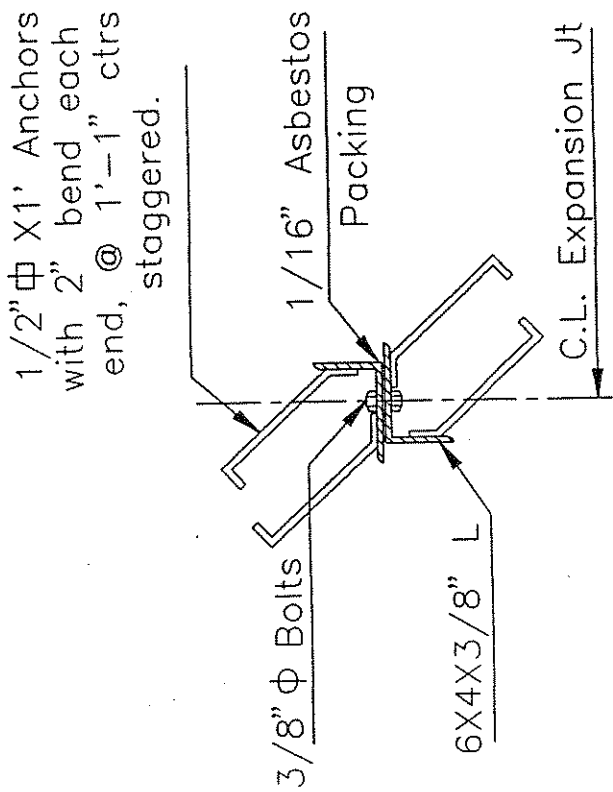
Fixed Bearing Assembly at both Abutments.
